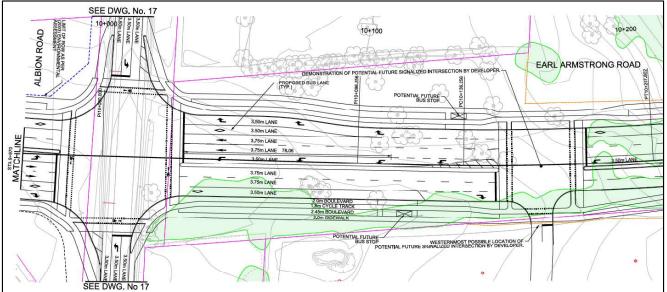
Earl Armstrong Road EA – Albion Road Intersection
